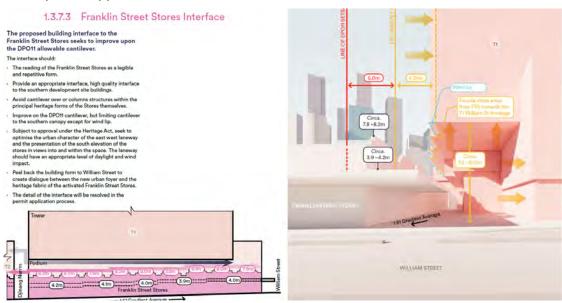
Section and view of the proposed cantilever and east-west link from William Street
